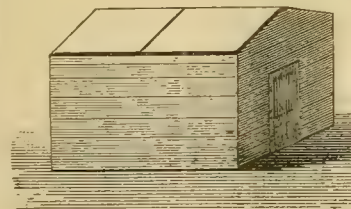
SHED FOR TELESCOPE—CLOSED.
